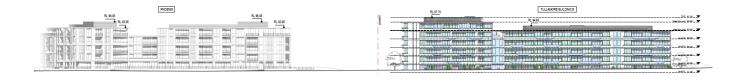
Doncaster Road Streetscape/Southern Elevation of existing Phoenix Building and Proposed Tullamore Building B.
